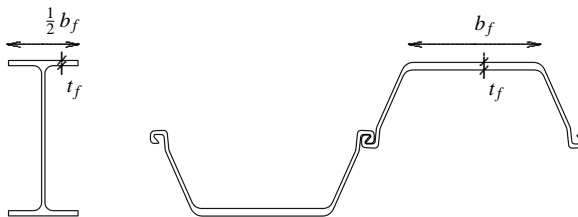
Structural requirements for I-sections and for steel sheet piles according to Weißenbach
